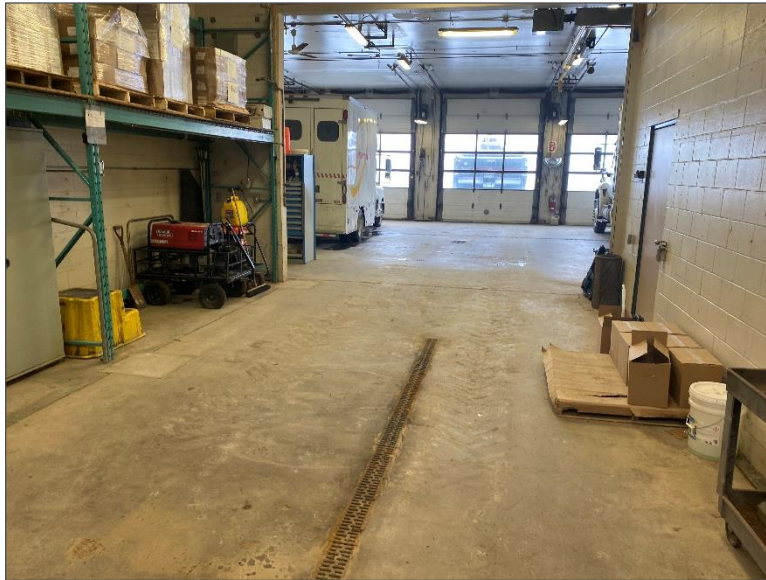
Floor trench located within the southwest portion of the Site Building.
